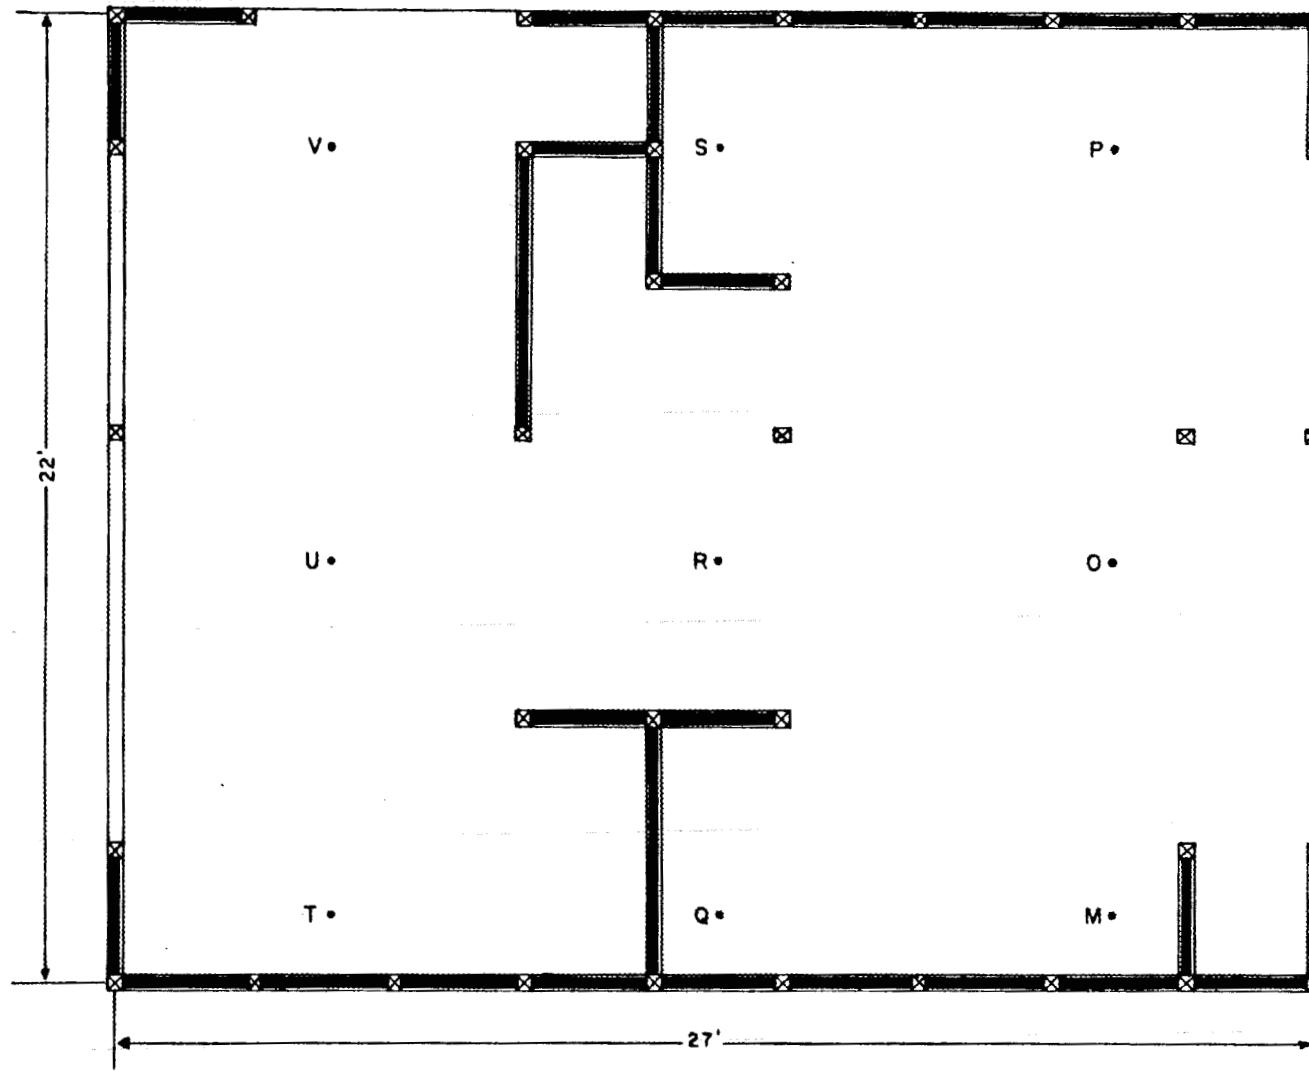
Floor Plan of BREN Type B House, Second Floor
